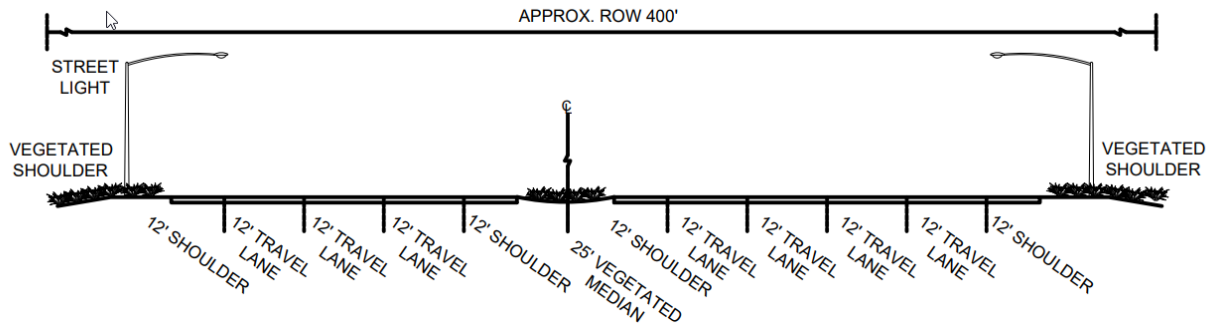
Seward Highway between Tudor Road and 36th Avenue
